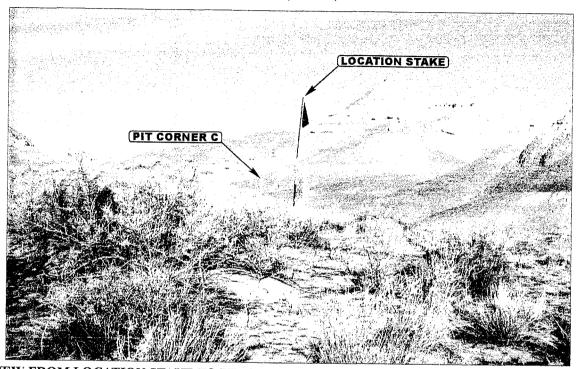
PHOTO: VIEW FROM LOCATION STAKE TO PIT CORNER C
